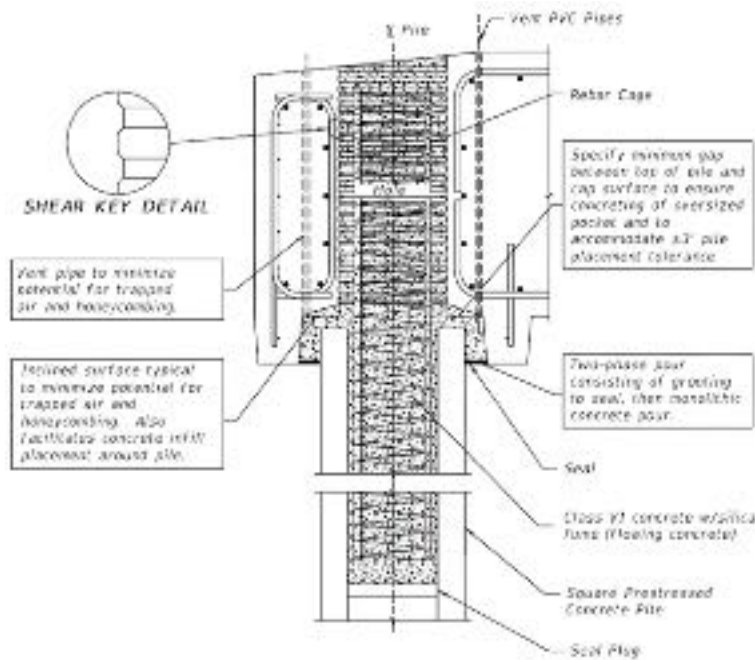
Precast Footing Details (Florida Department of Transportation, 2017)
